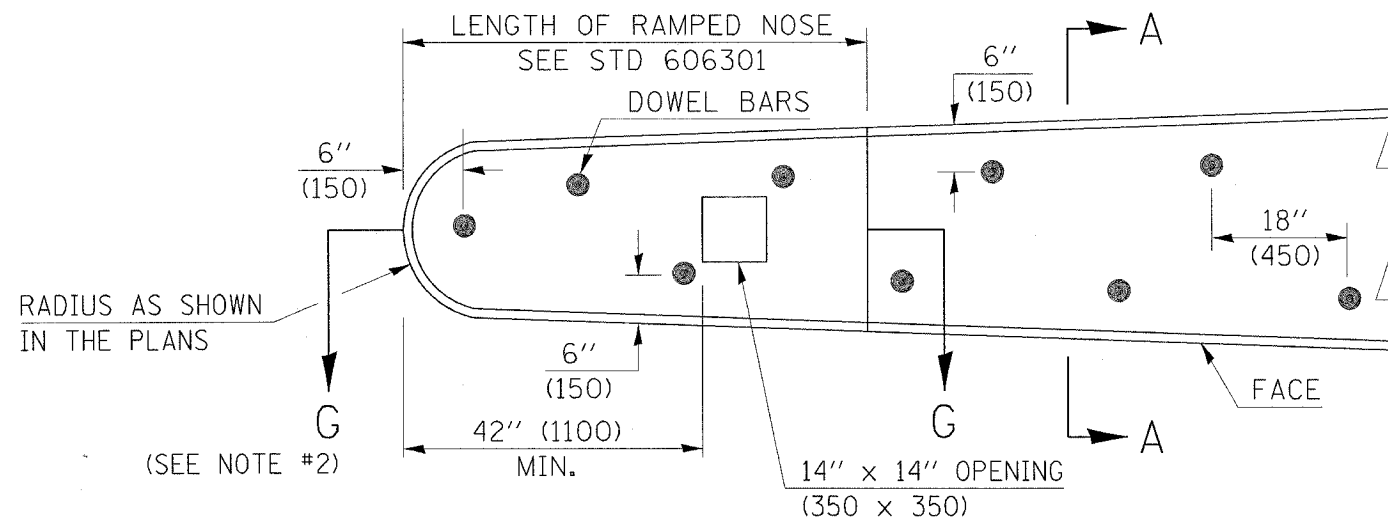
DETAIL OF CONCRETE MEDIAN, TYPE SB-6 (DOWELED)
